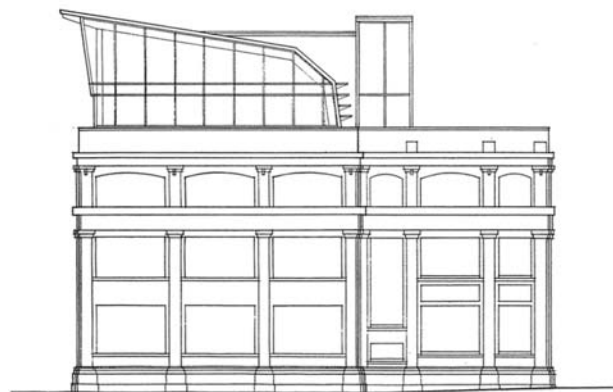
Section view, Schwartz/Silver glass structure addition to the roof of Rand Hall.
